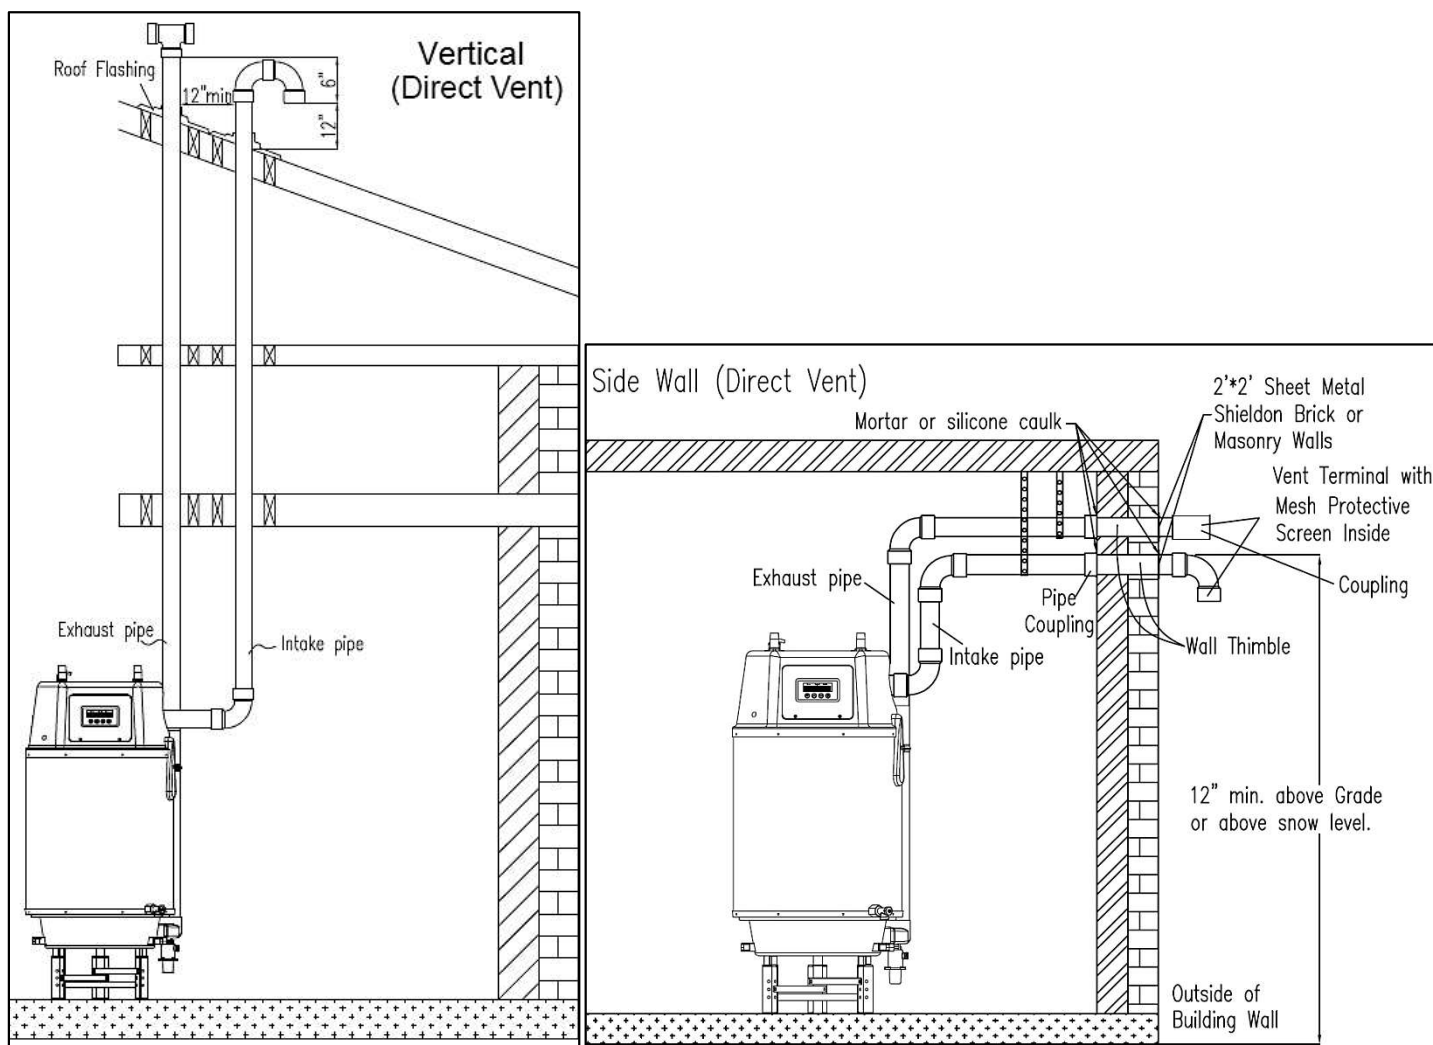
Direct Vent, Roof and Sidewall Vent Terminations
